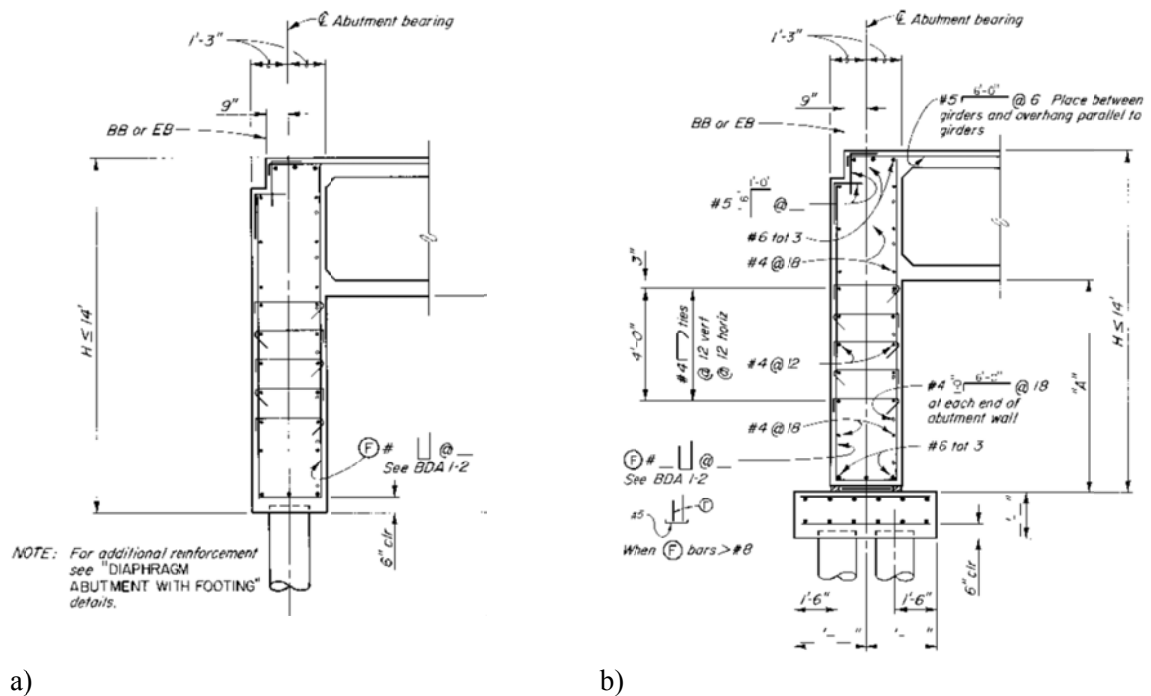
Standard details for diaphragm abutments a) without footing, and b) with footing (Source: BDA, 2009)
